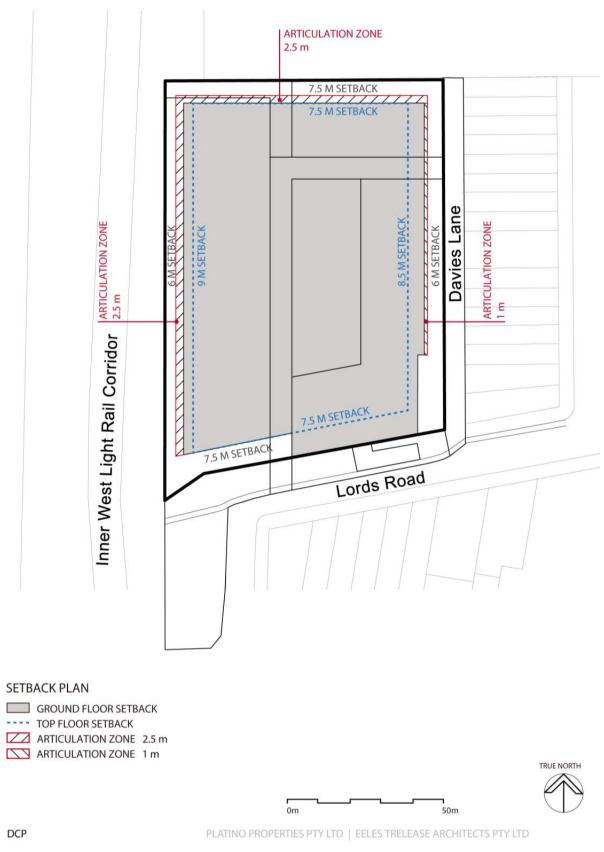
Extract of Figure G41 – Setback Plan – 67 – 73 Lords Road, Leichhardt, Draft Development Control Plan – May 2014
